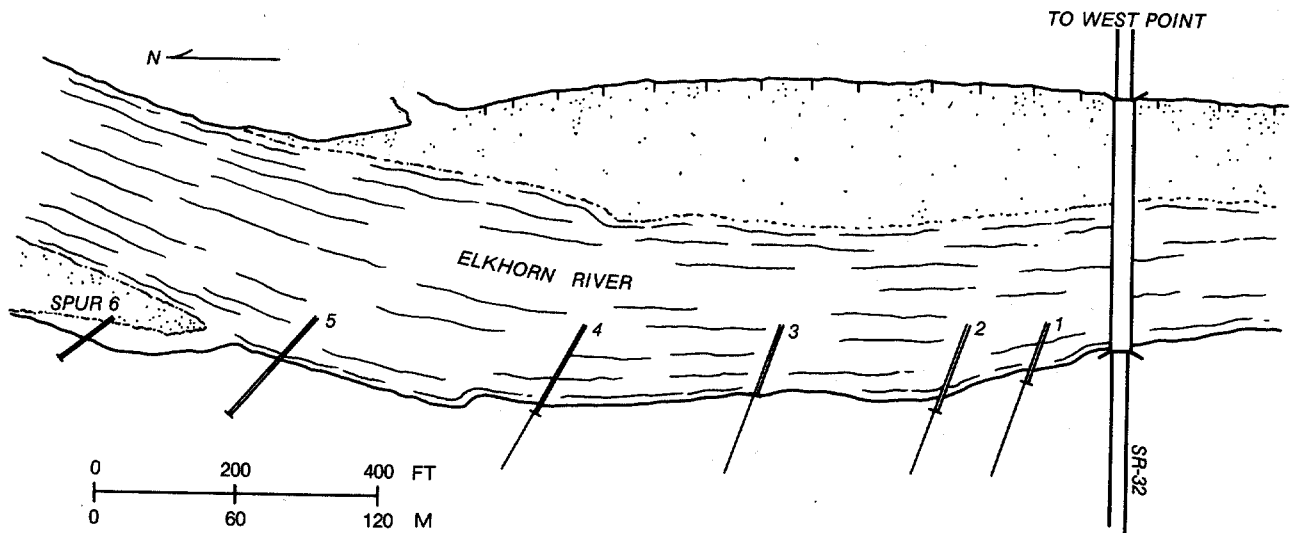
Plan sketch showing layout of spurs at SR-32 crossing.
